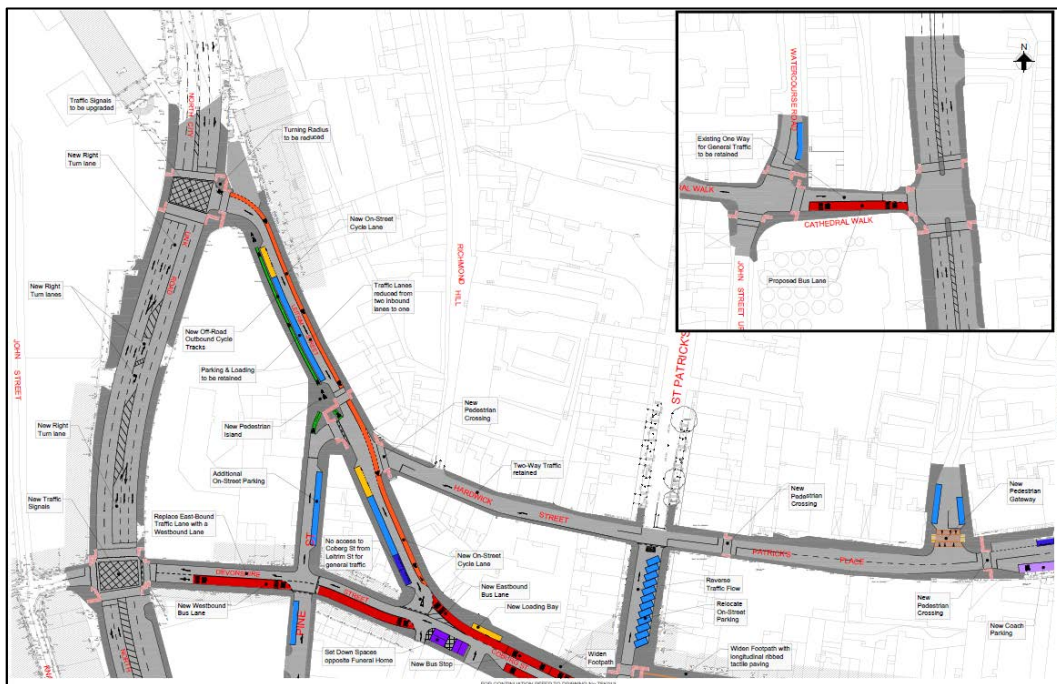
Street improvement works – Sheet 2 of 4 | Not to Scale
